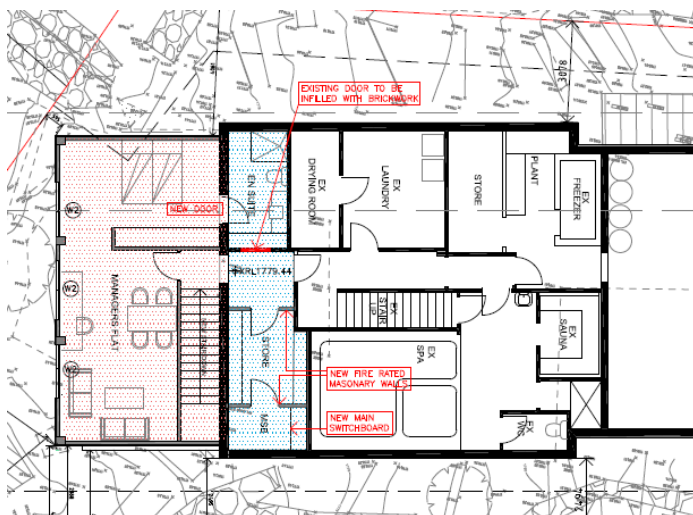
ENTRY LEVEL ADDITION FLOOR PLAN
